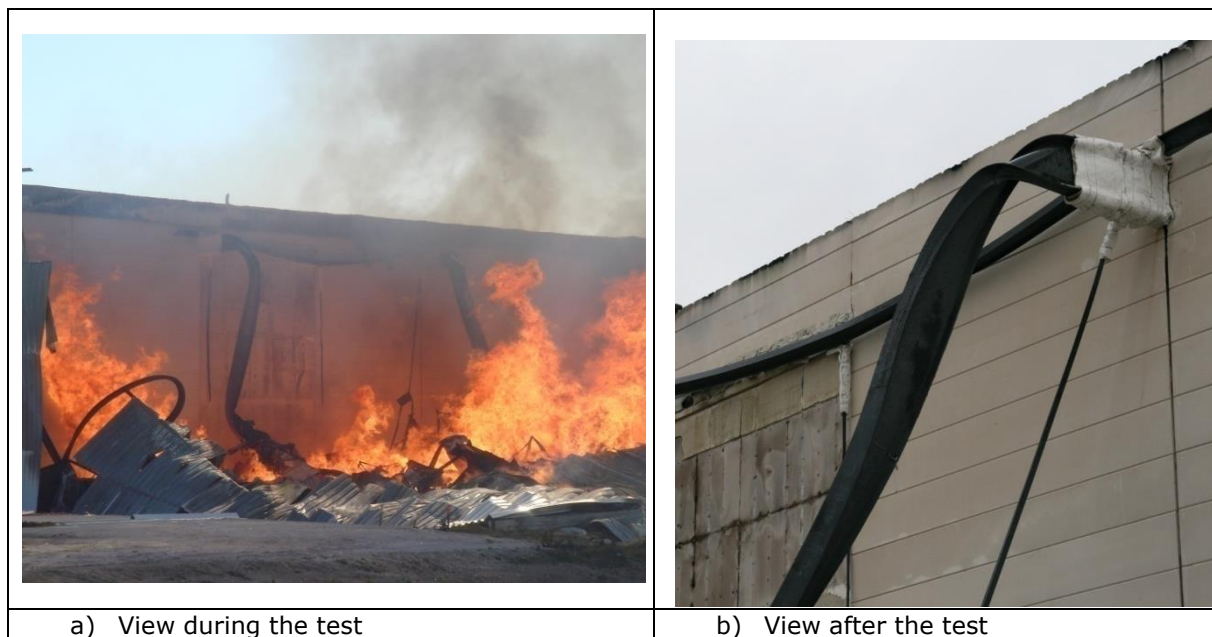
Fire test on a fire wall crossed by steel purlins – Flumilog project
